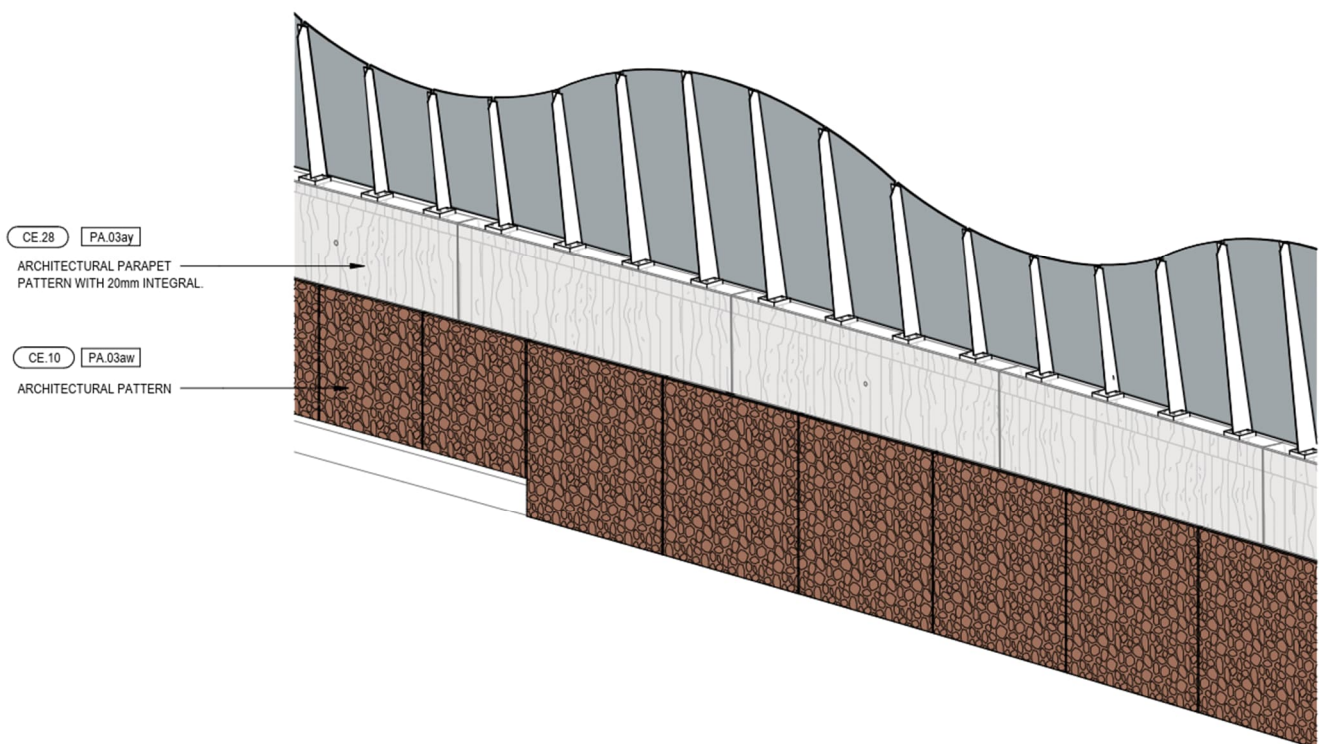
Axonometric view of the Bridge 02 eastern abutment wall
